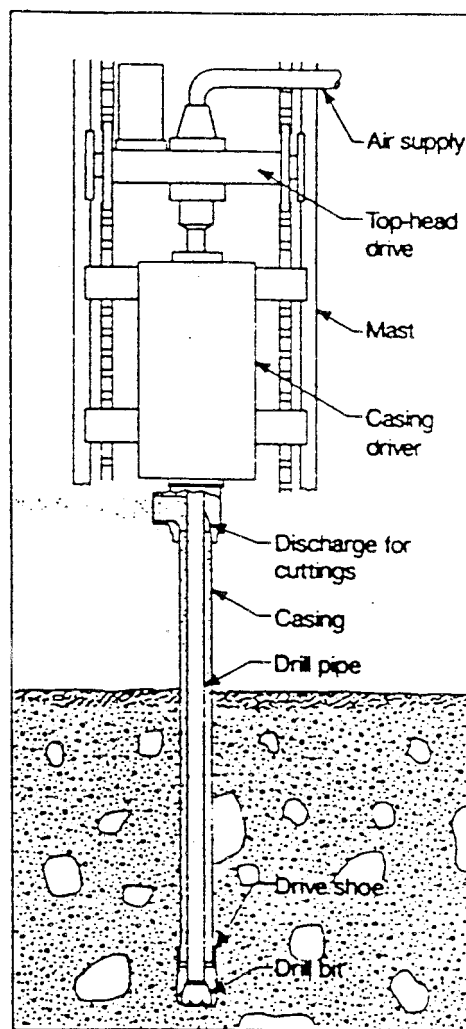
Casing Drivers can be Fitted to Top-Head Drive Rotary Rigs to Simultaneously Drill and Drive Casing
